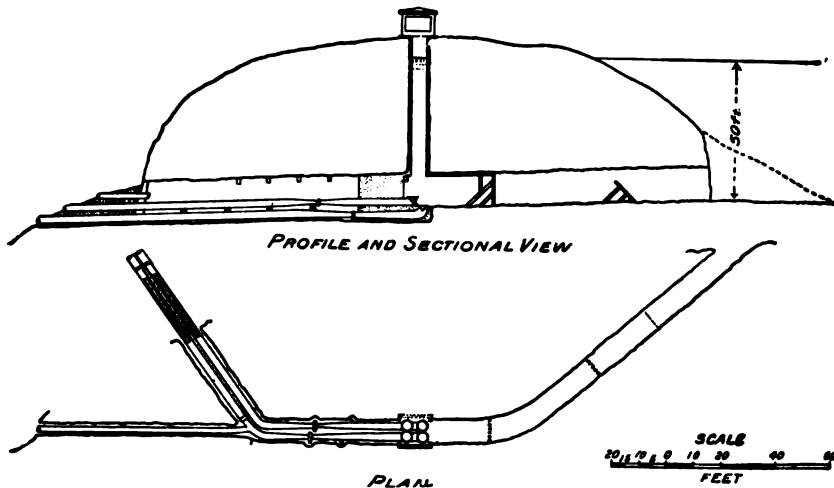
PROFILE AND SECTIONAL VIEW AND PLAN OF WASTEWAY TUNNEL, SWEETWATER DAM.
